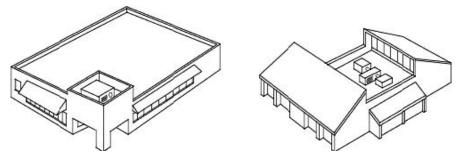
Examples of how to screen roof-mounted mechanical equipment.
